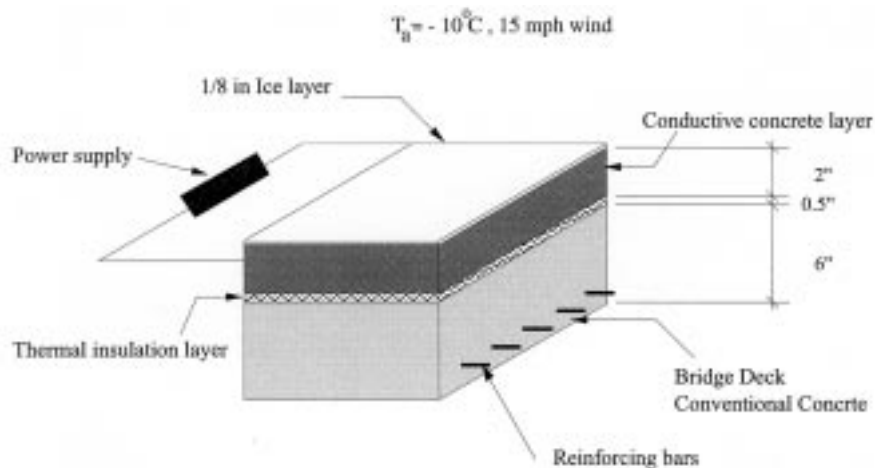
Concept of using conductive concrete overlay for bridge desk deicing.
